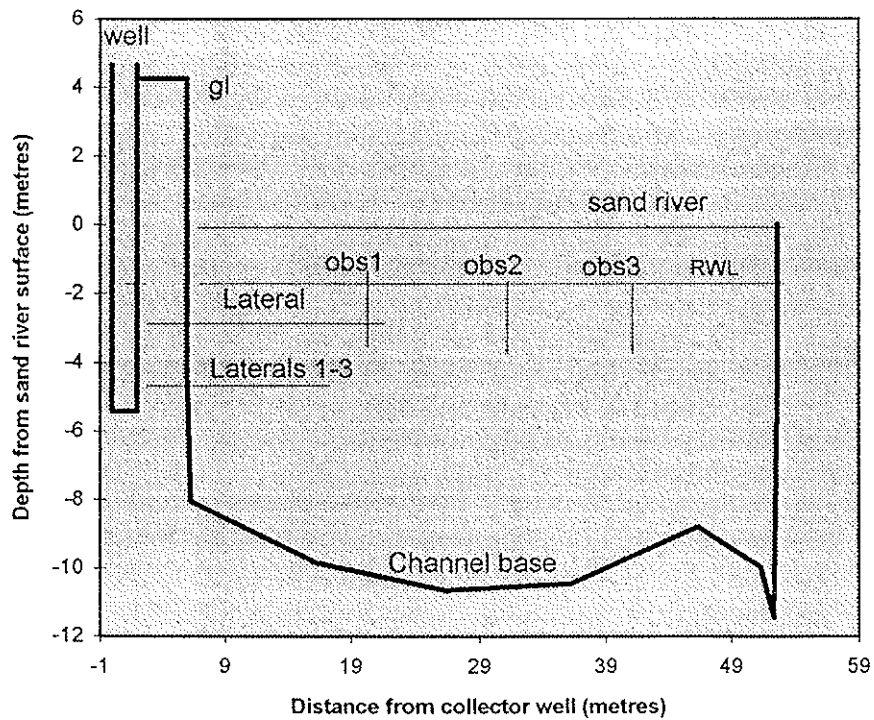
Probed cross section across Shashe River at Gulubane site showing location of laterals, observation boreholes and collector well.
